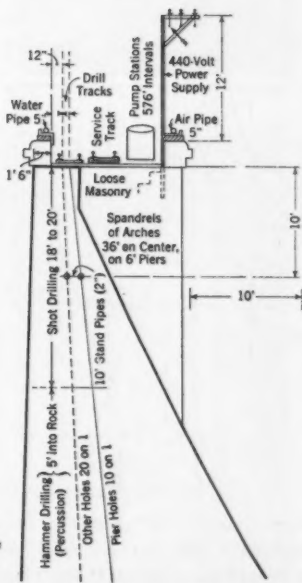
TYPICAL SECTION, WALWHAN DAM, SHOWING ARRANGEMENT OF PLANT.
